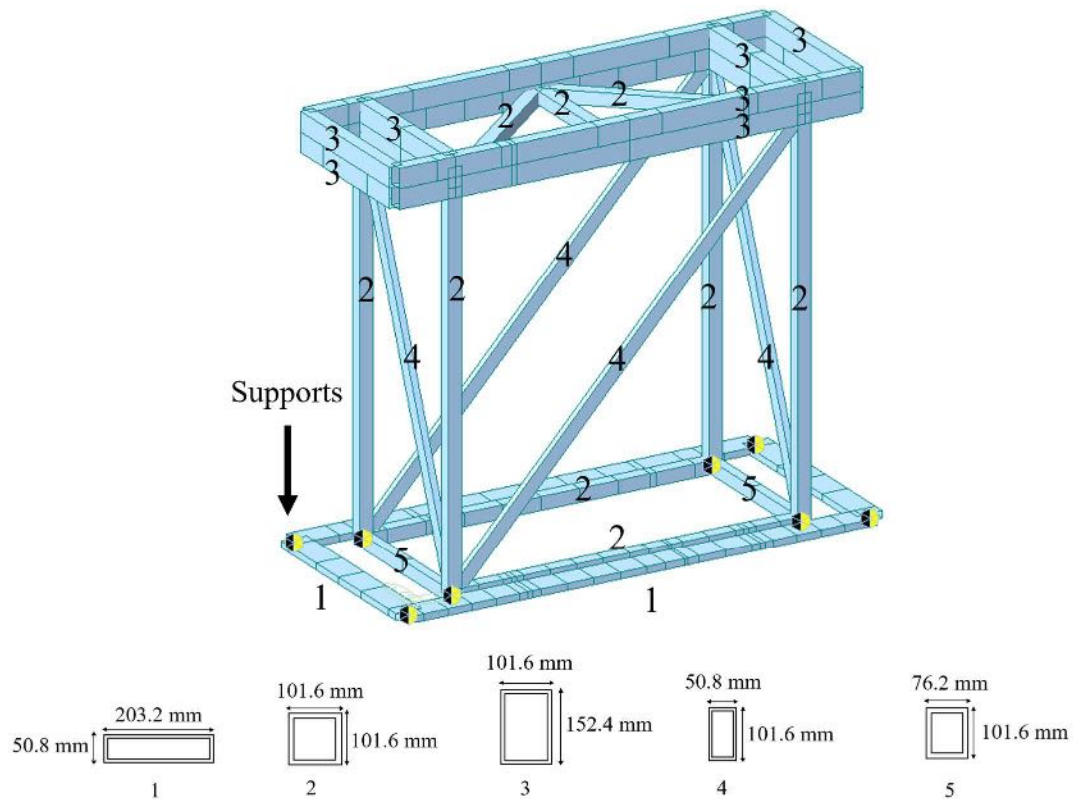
FE model of the supporting steel structure with its bolted connections to the turntable, framing layout, and the cross sections of the five framing profiles.
